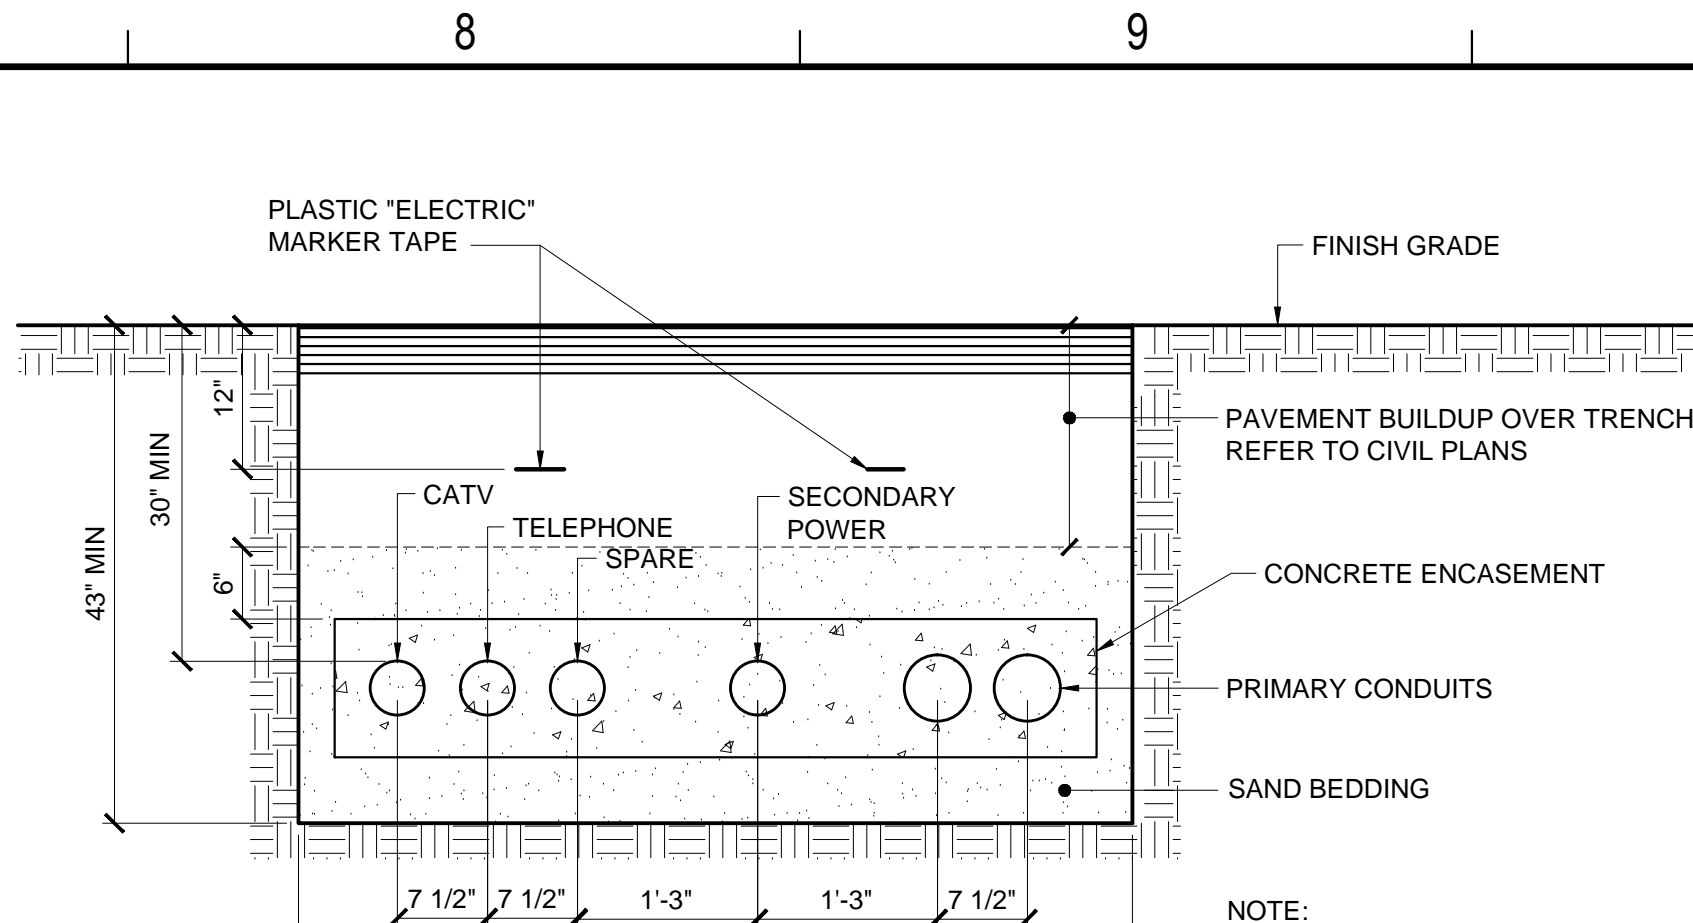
DETAIL INDICATES TYPICAL SPACING BETWEEN CONDUITS OF VARIOUS SYSTEMS, REFER TO SITE PLAN FOR SIZES AND NUMBER OF CONDUITS
